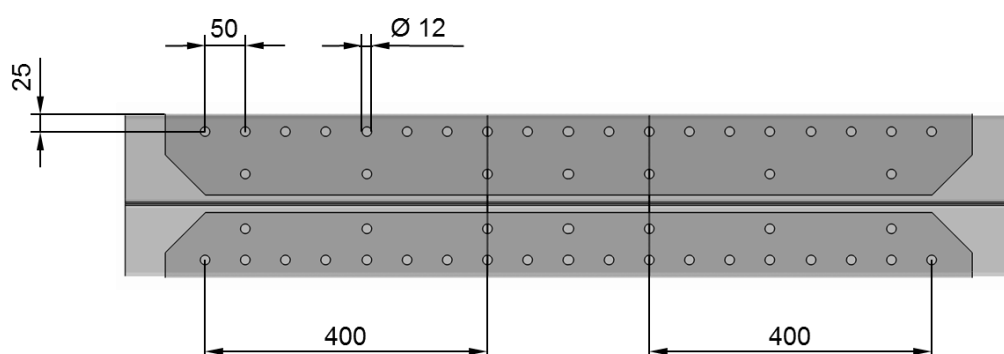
Dimensions of the welding holes in the connection pieces
